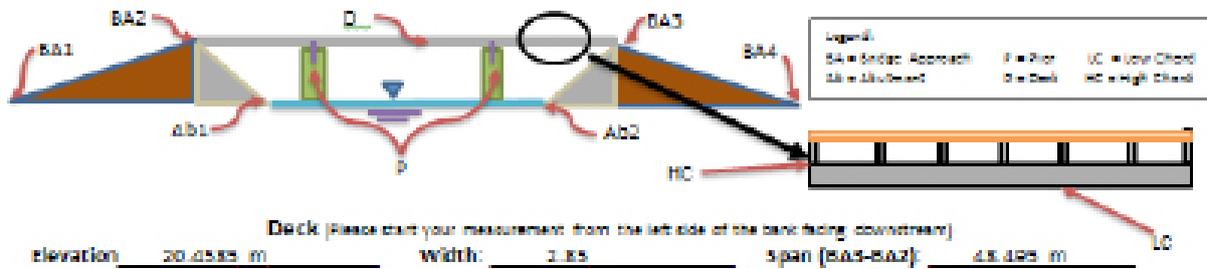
Cross section diagram at Kilicao Bridge in Daraga, Albay
